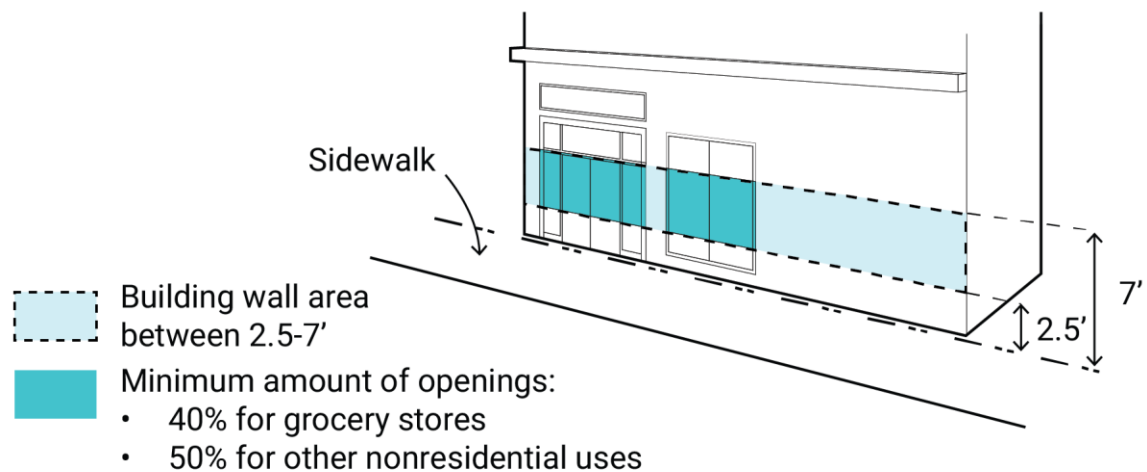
(B)(6)(a): Nonresidential window openings and transparency
